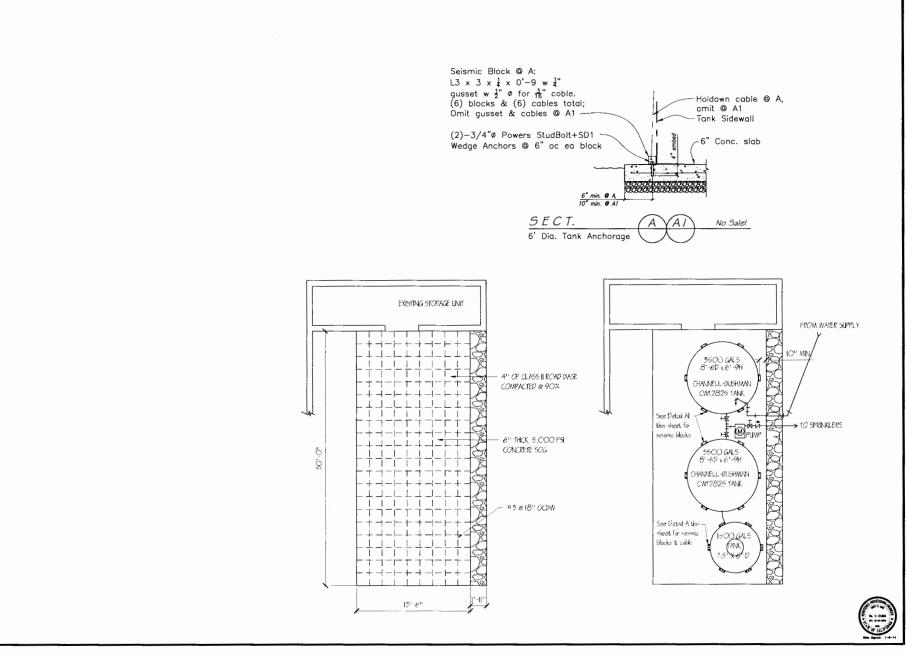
A-4-STB-16-0046 (McGaughey) Project Plans
